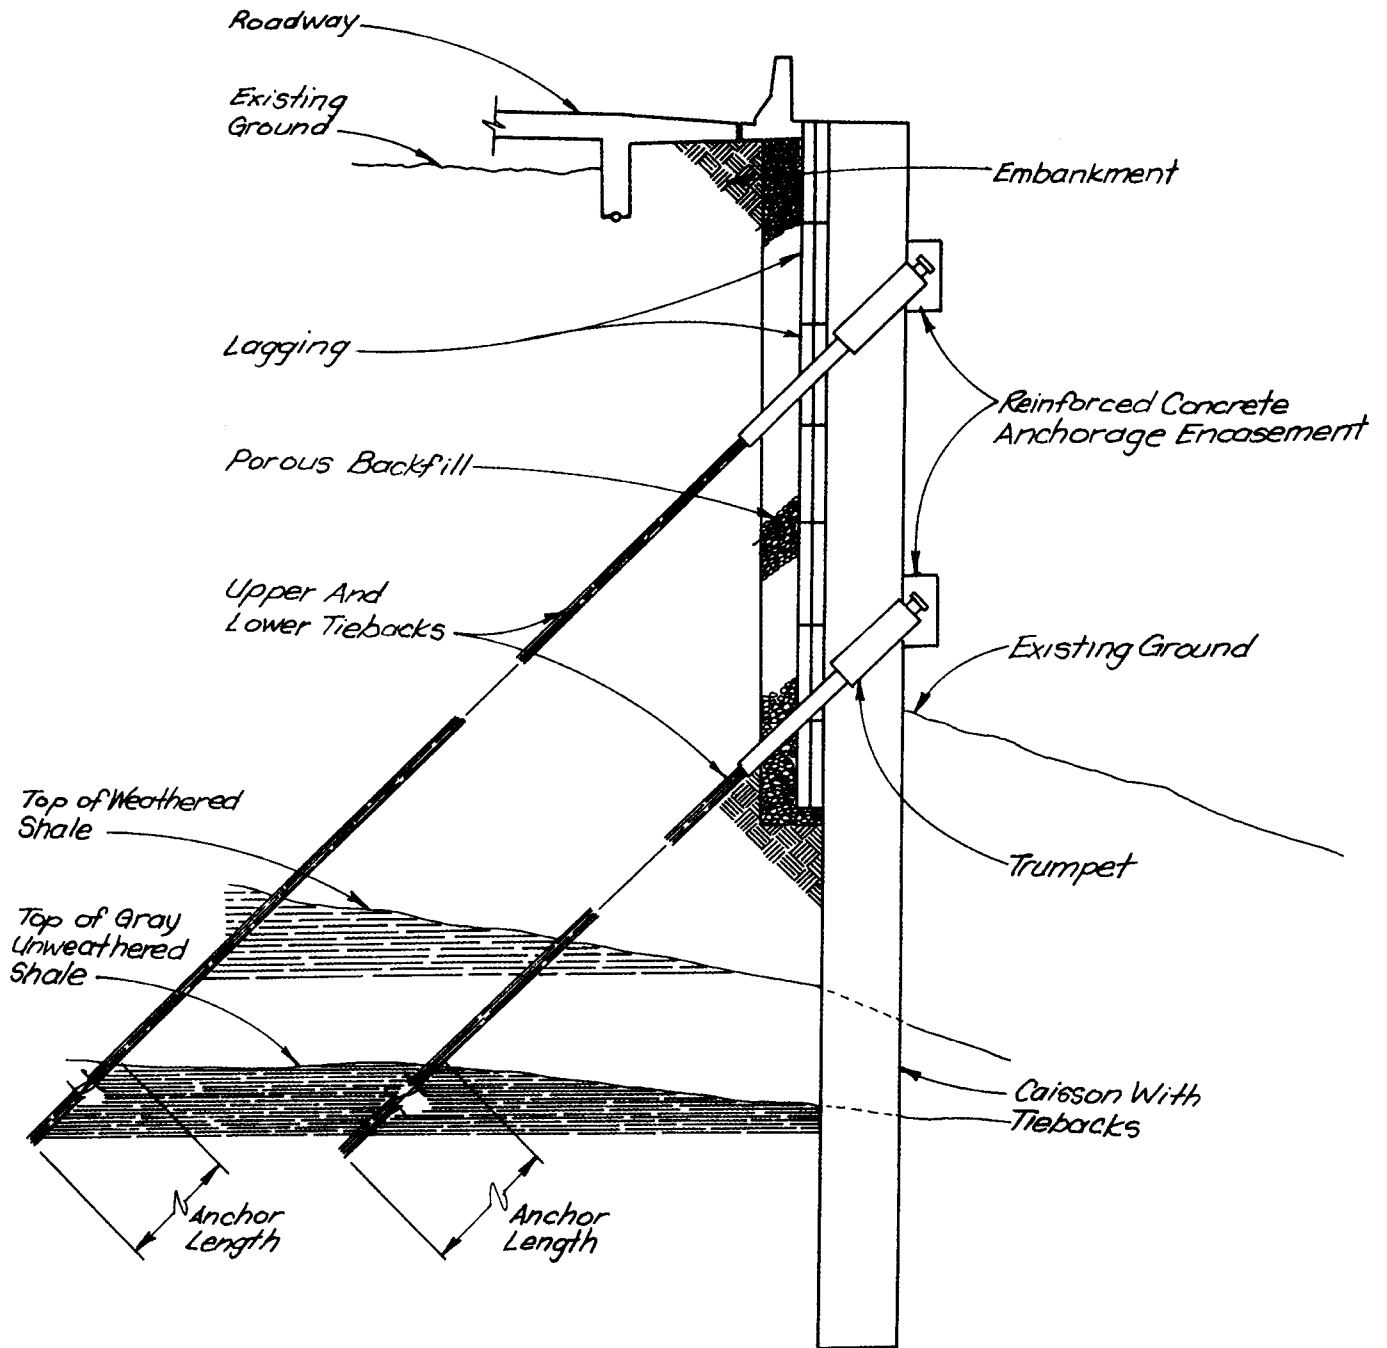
Design of a typical tied-back pier wall. Tied-back pier walls are similar to cantilevered pier walls, but resistance to sliding is increased by adding steel tiebacks anchored in stable shale bedrock.
